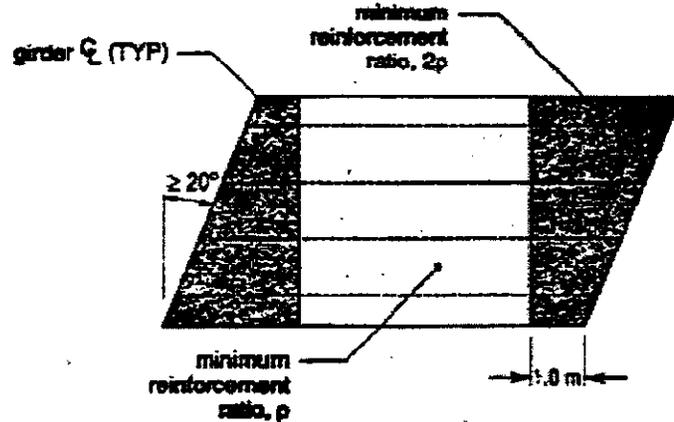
OHBDC reinforcement pattern for skewed deck bridges (Jaeger et al 1995)
